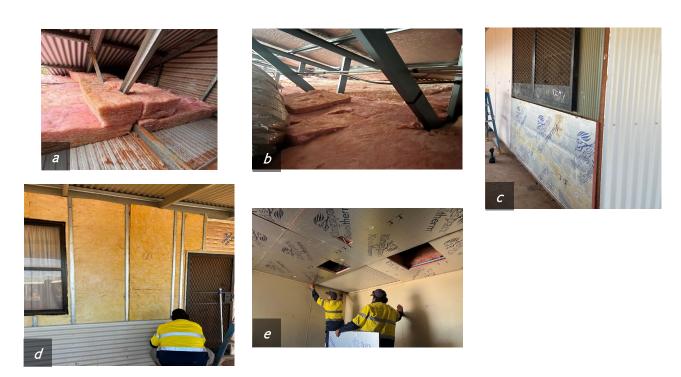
Installation of thermal bridging mitigation measures: (a) glasswool batt segments covering roof truss bottom chord; (b) semi-rigid glasswool rolled through trusses; (c) rigid foam board added to external walls; (d) semi-rigid insulation affixed to external walls with furring system; (e) rigid foam board added to ceiling.
